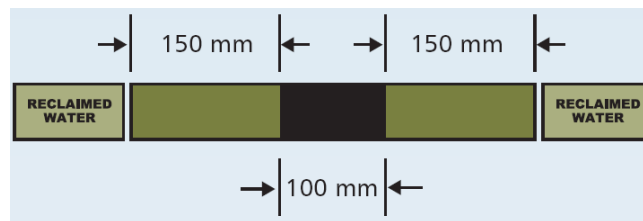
Recommended Labelling for Reclaimed Water Pipes Located Inside Buildings
